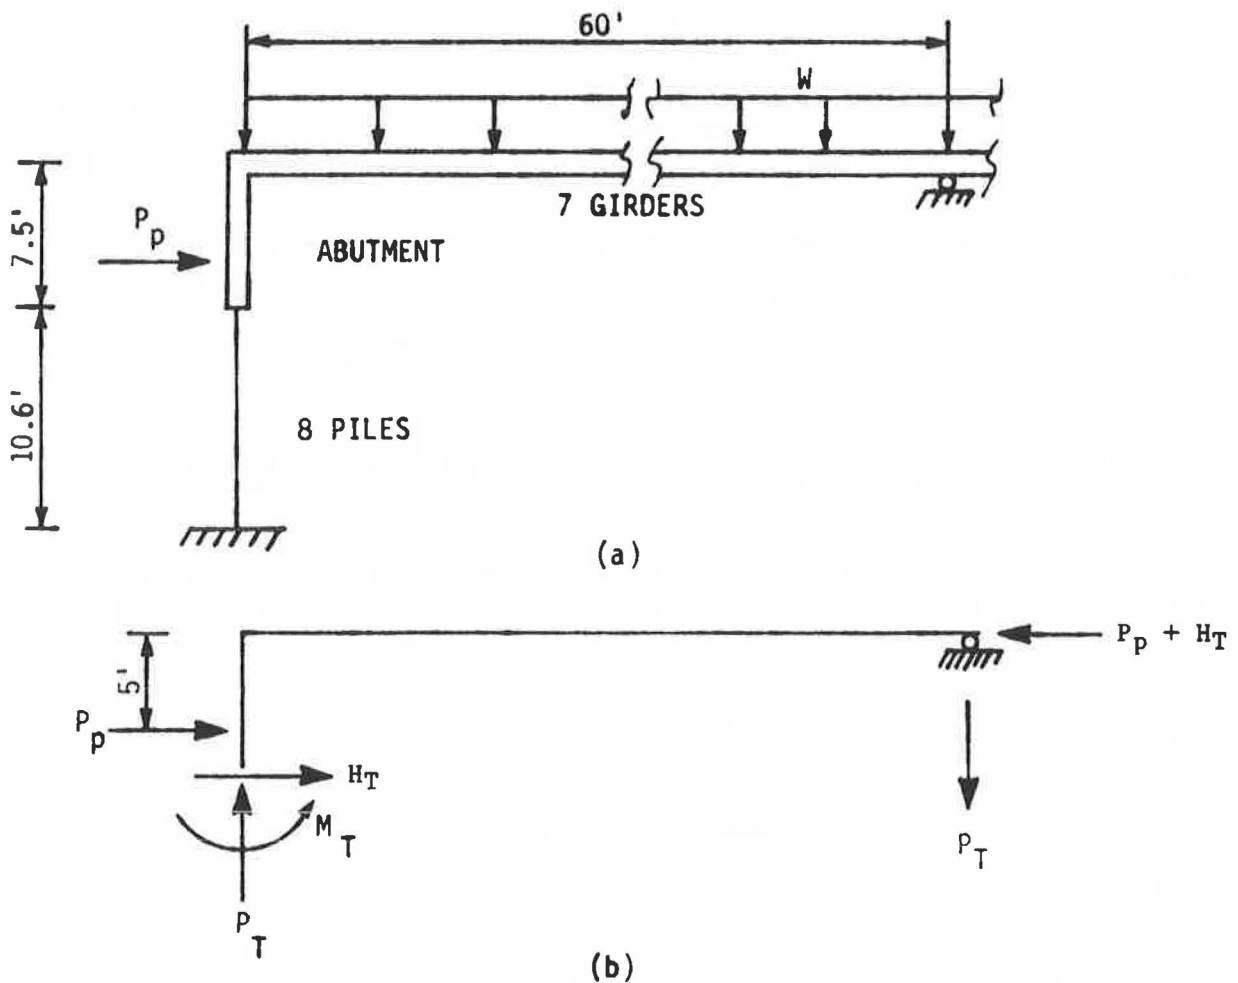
Idealized abutment foundation and girder end span: (a) structural model and (b) free body diagram.
